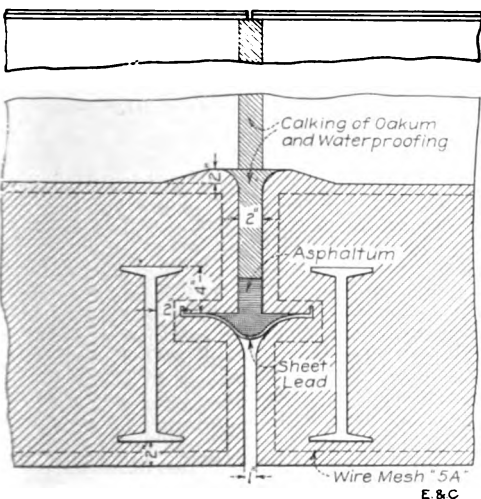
Detail of Joint in Floor Slab for Arch Bridge.
